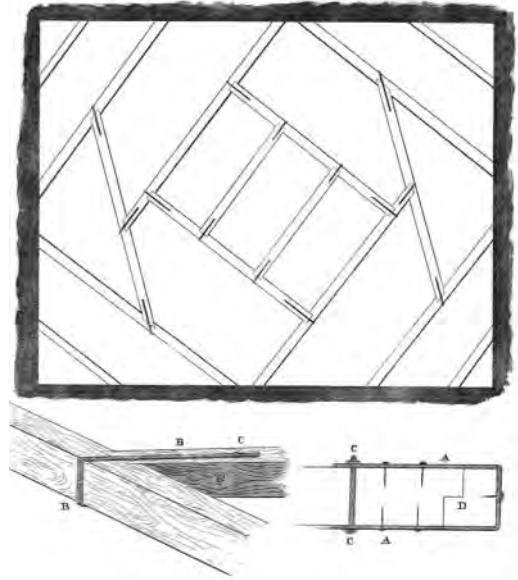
Drawing by Giuseppe Valadier (1831) of a floor built with beams shorter than the span to be covered, and details of the reinforcement of the joints with iron straps.
